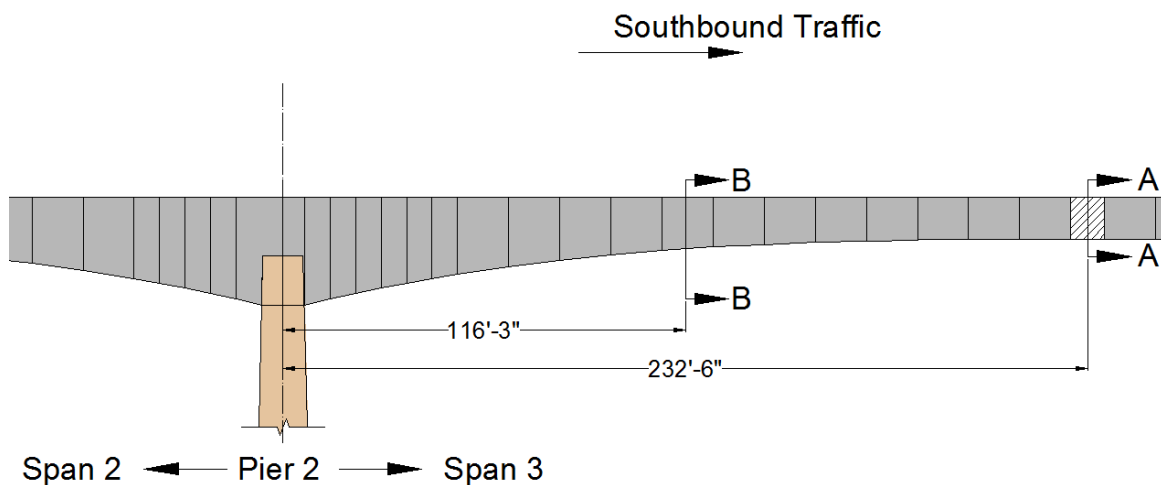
Smart Road Bridge Elevation View of Span 2 and 3
